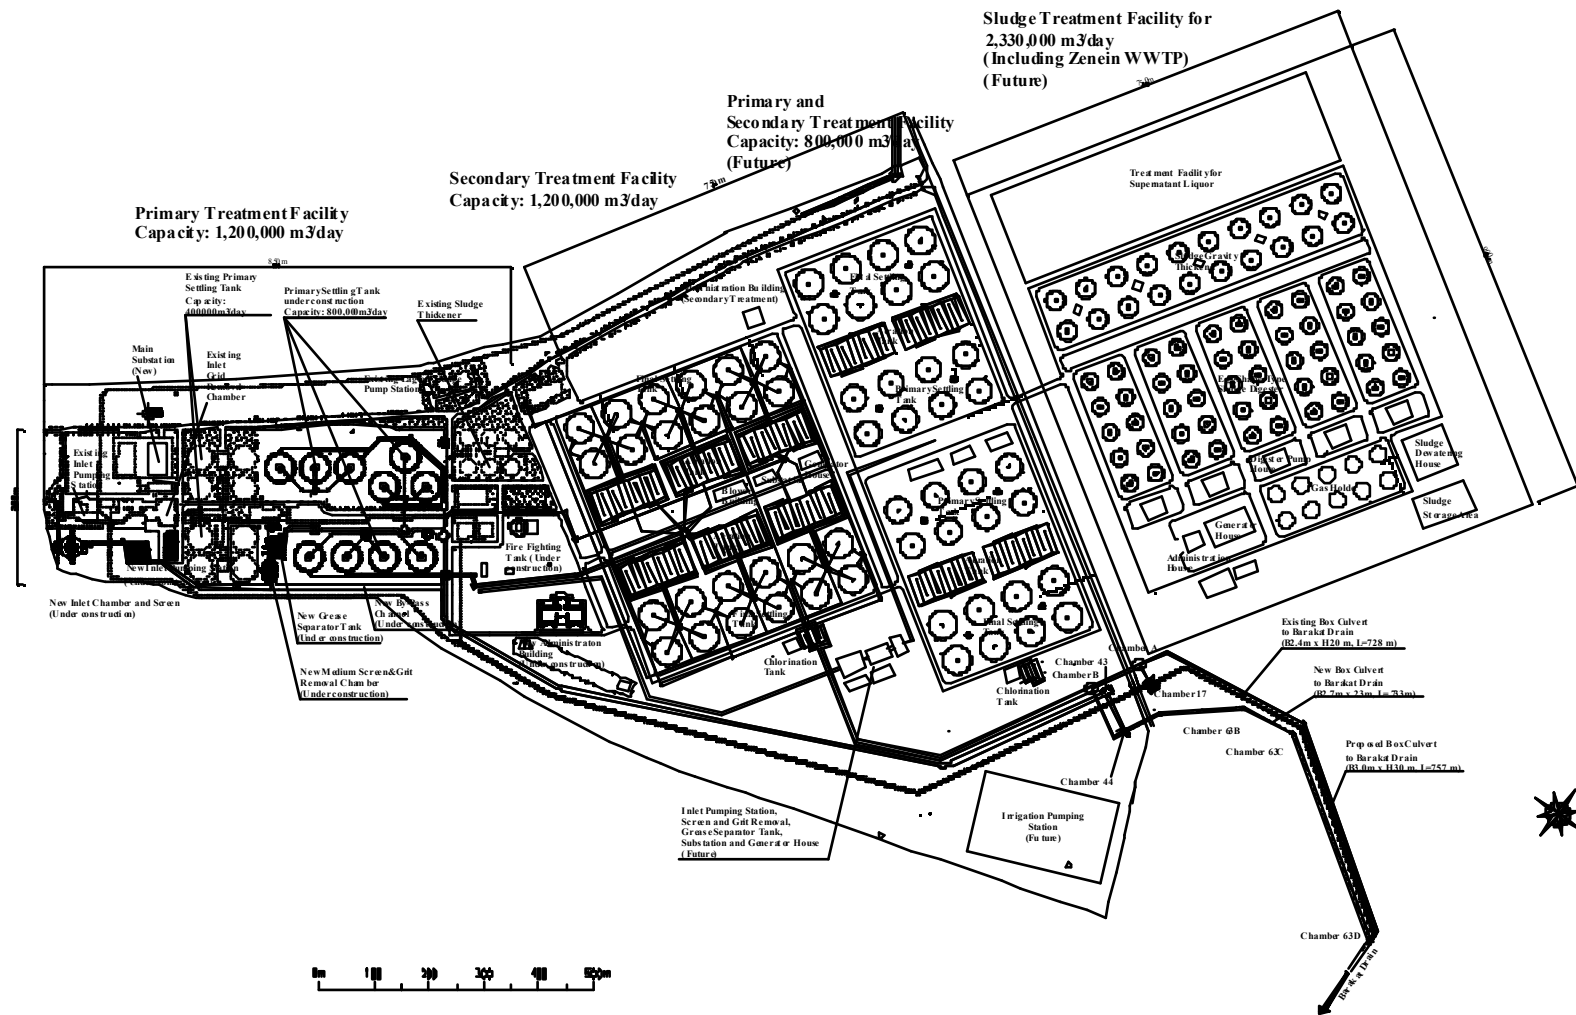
General Layout of Planned Facilities of Abu Rawash WWTP
